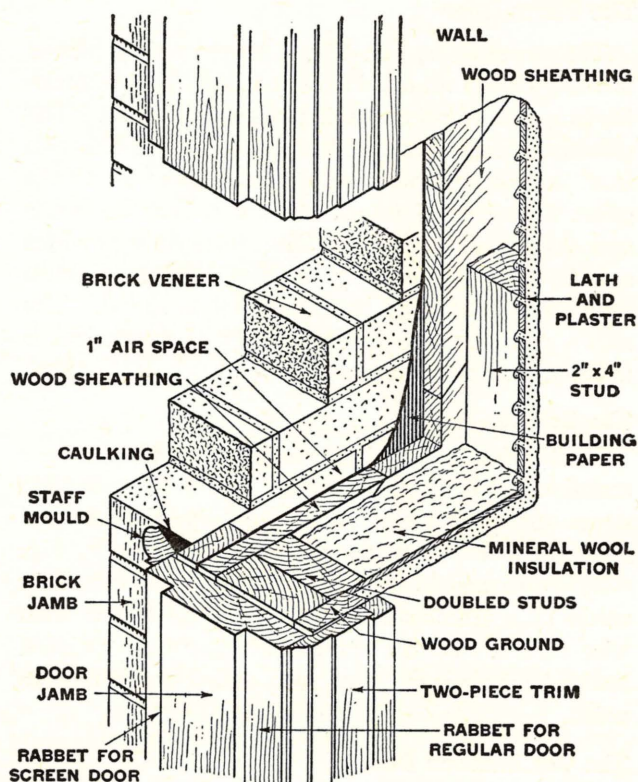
Cut-away section view showing construction of wall and frame of an outside door
